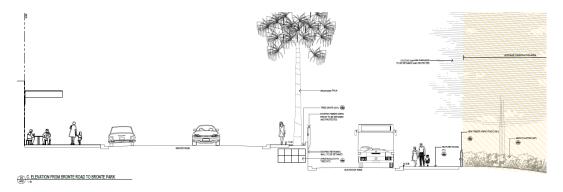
Section indicating café strip to the south and bus zone at a lower level to the north of Bronte Road (Source: Group GSA, Sections and Elevations L6002 E 19/10/2018).
